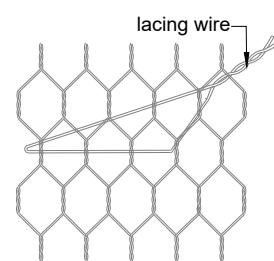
DETAIL (A) TYPICAL DETAILS OF REINFORCED SOIL STRUCTURE
